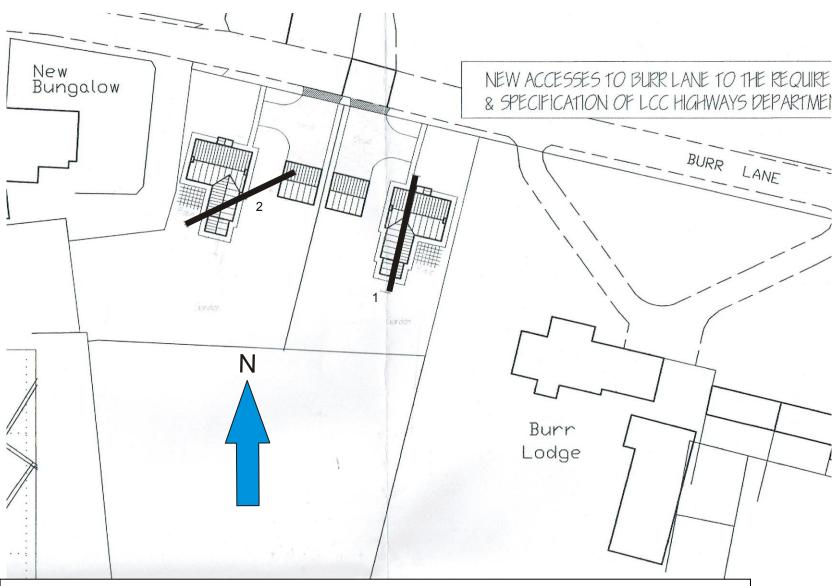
Plan of the proposed and final layout of trial trenches, at an original scale of 1:500 (extract from Architects plan)
